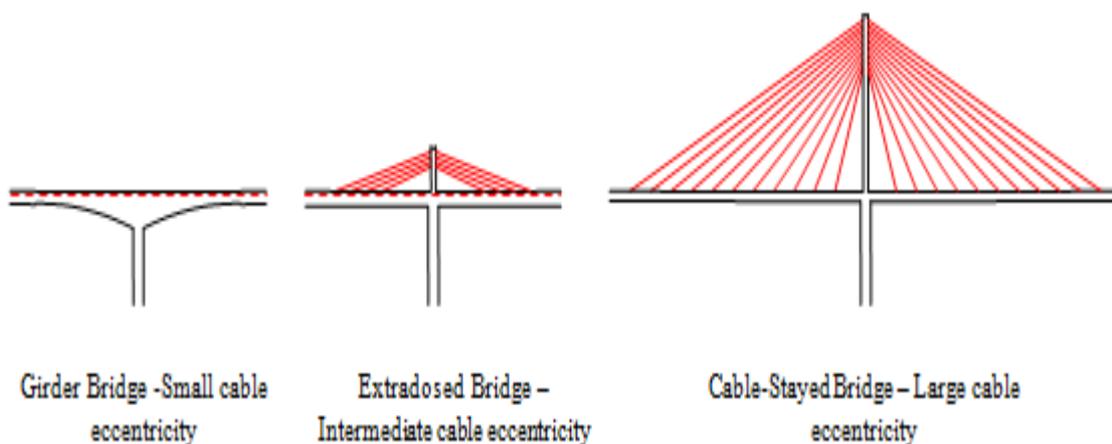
Figure showing Cable arrangements in Girder Bridge, Extradosed Bridge and Cable stayed bridge
